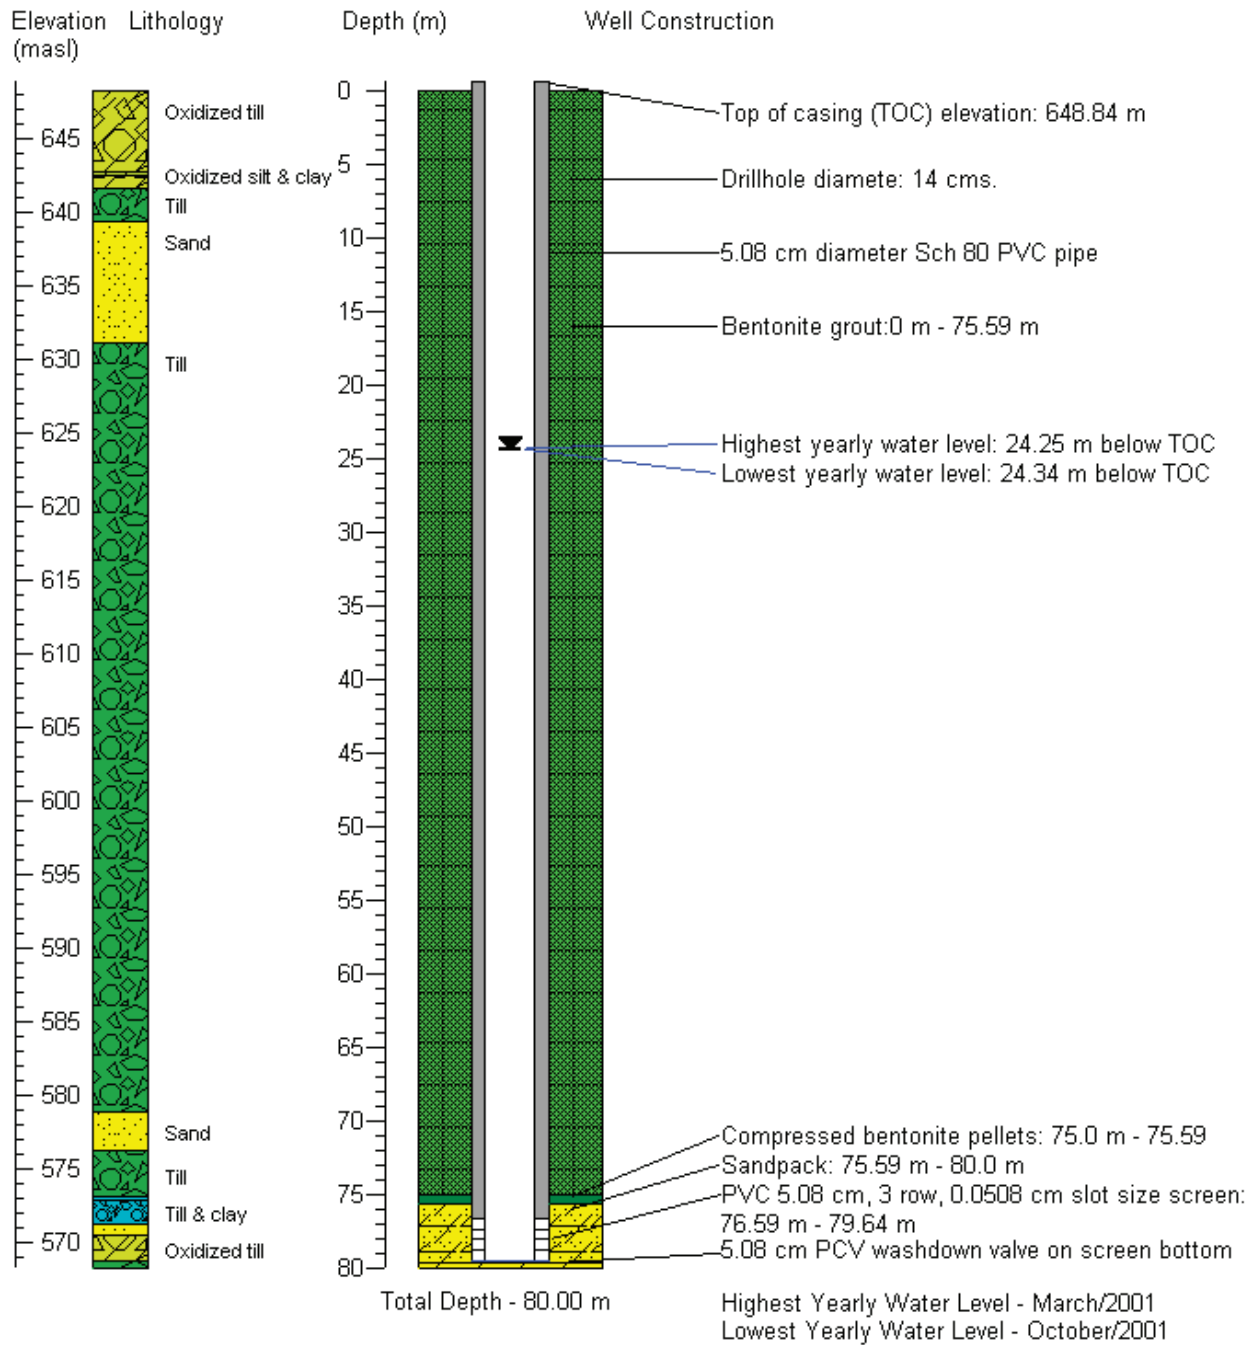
Piezometer construction details: WEPA 00-3-79
